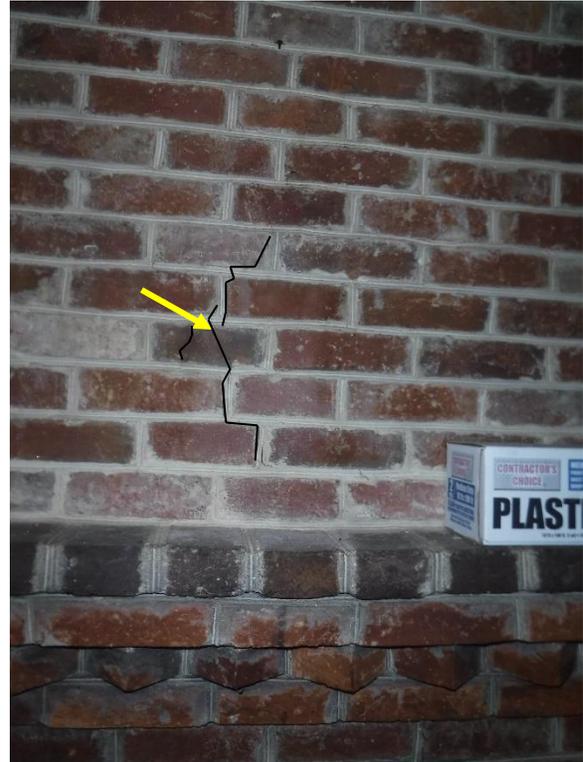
Cracking at fireplace in kitchen. Cracks traced for clarity.
